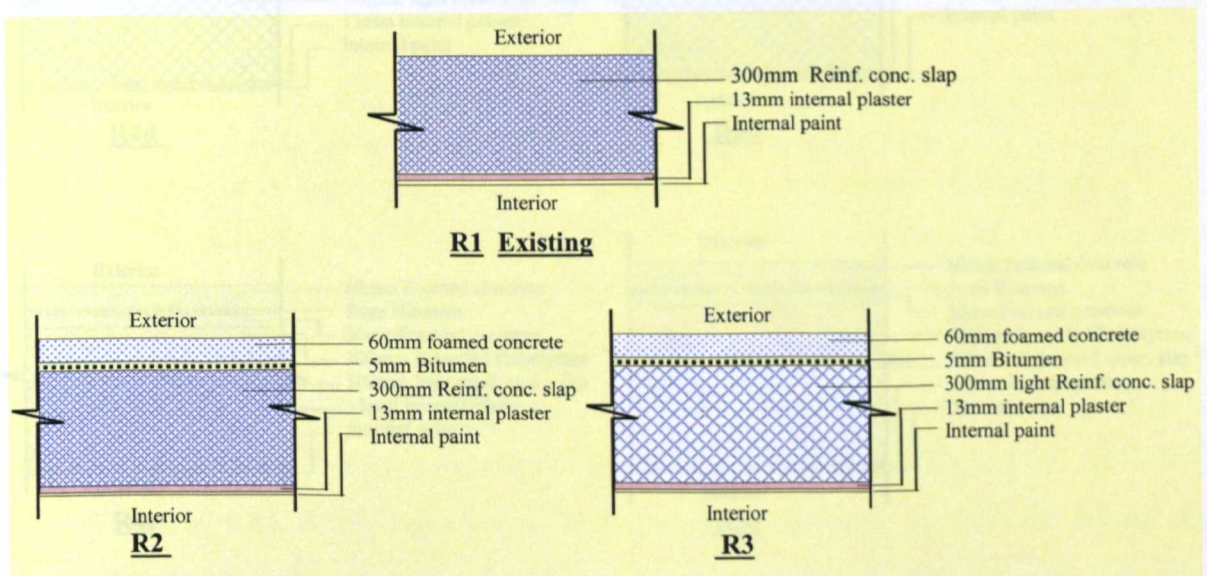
Detailed drawings for existing roof (R1) and the proposed roofs (R2 and R3)
